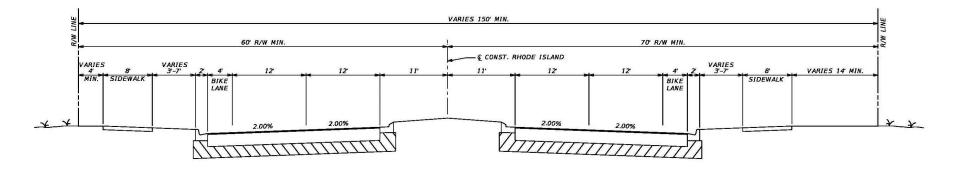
I -4, Segment 4 Proposed Typical Section
